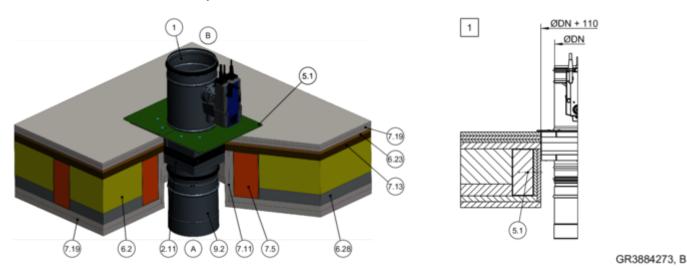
Dry mortarless installation in lightweight ceiling (ADK modular room system) with installation kit TQ2, drawn standing (also applies to suspended arrangement)
